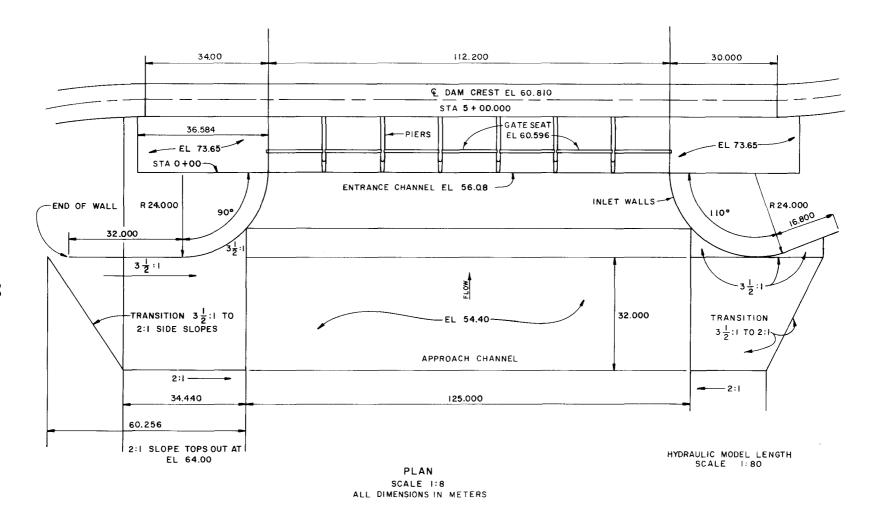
Recommended design of inlet walls and approach channel—Choke Canyon Dam.
